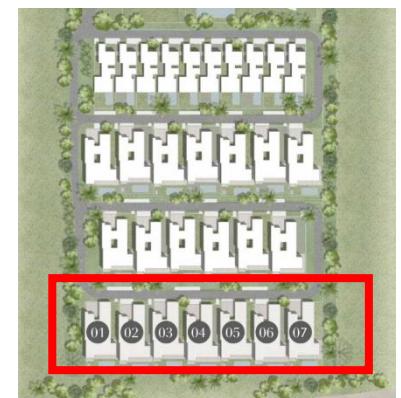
master plan 5-BEDROOM SIMPLEX VILLAS
